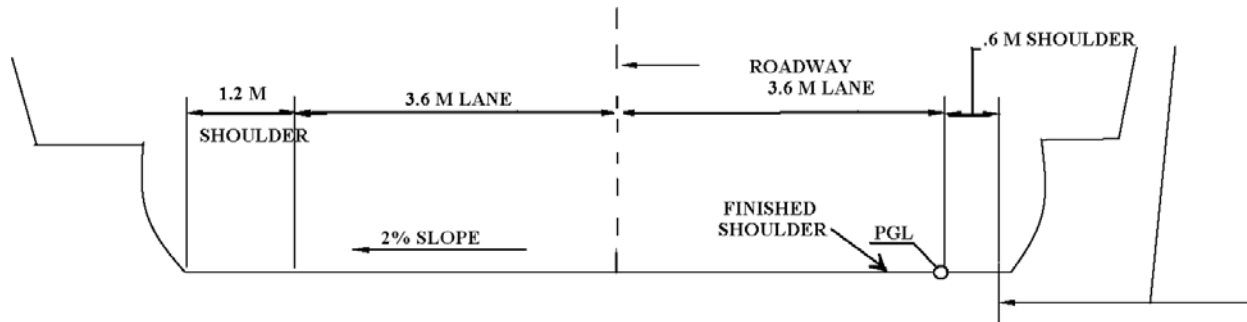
Typical Tunnel Roadway with Reduced Shoulder Widths
